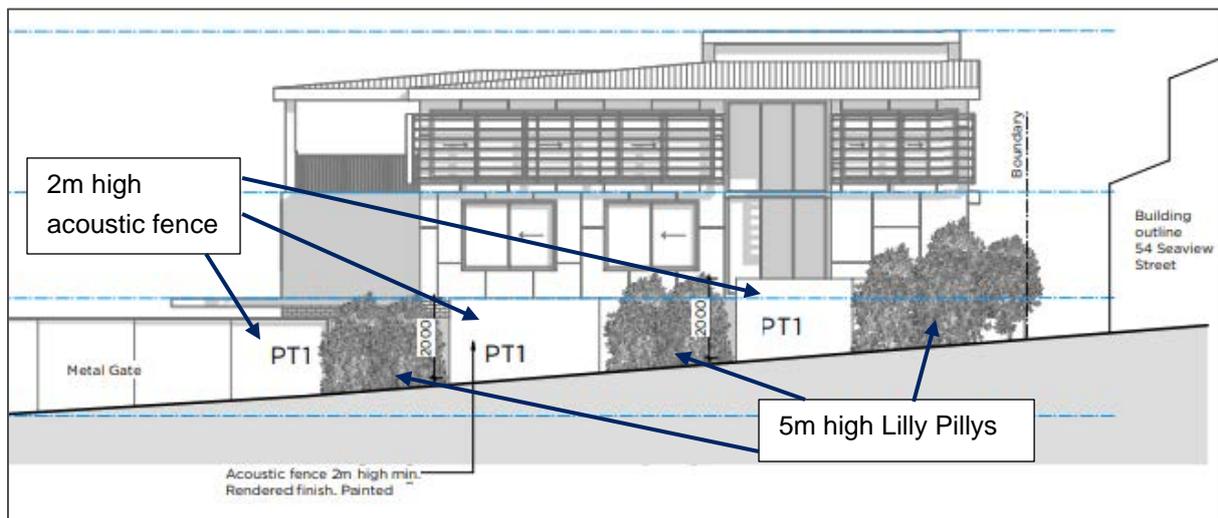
| Proposed Maintenance Building as viewed from Seaview Street (Source: Applicant's SRtS 2021)
